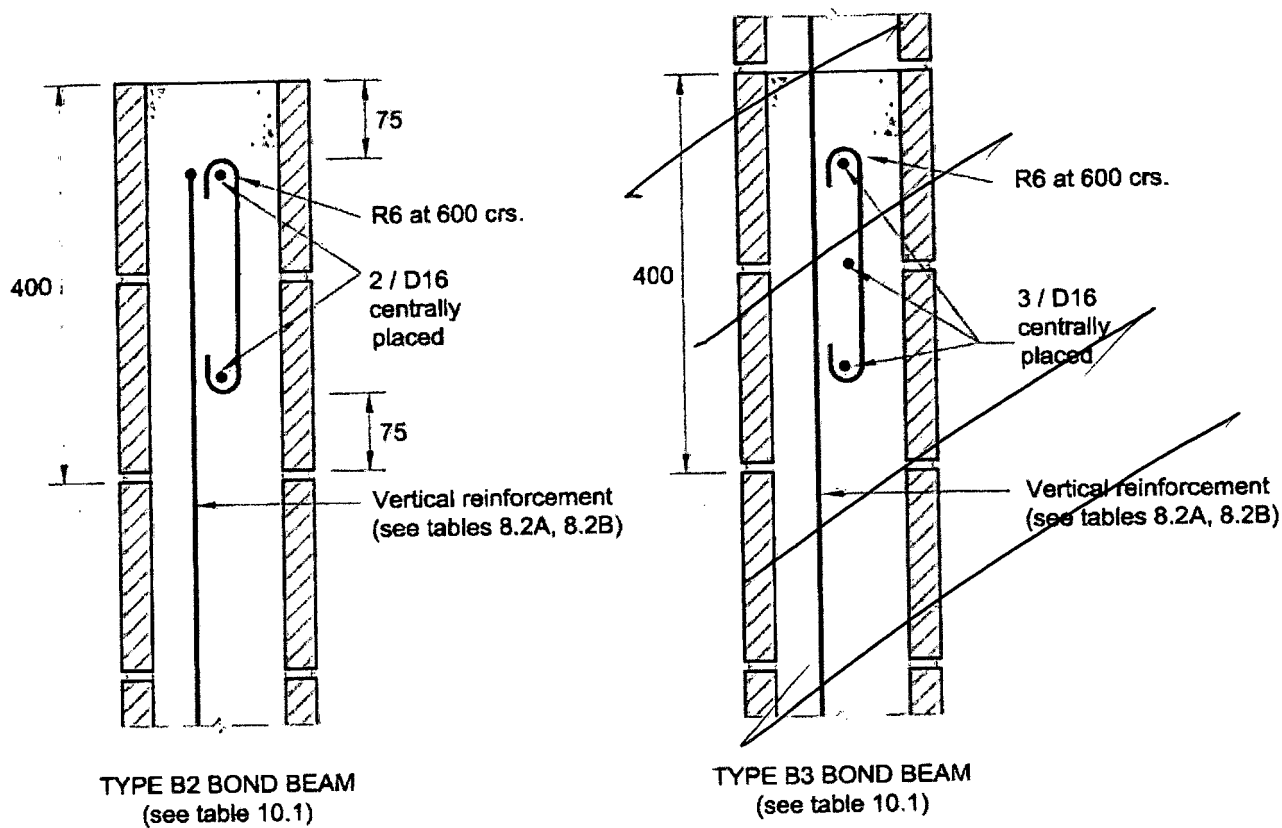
Bond beam details – Bracing line system (see 10.2.1)
